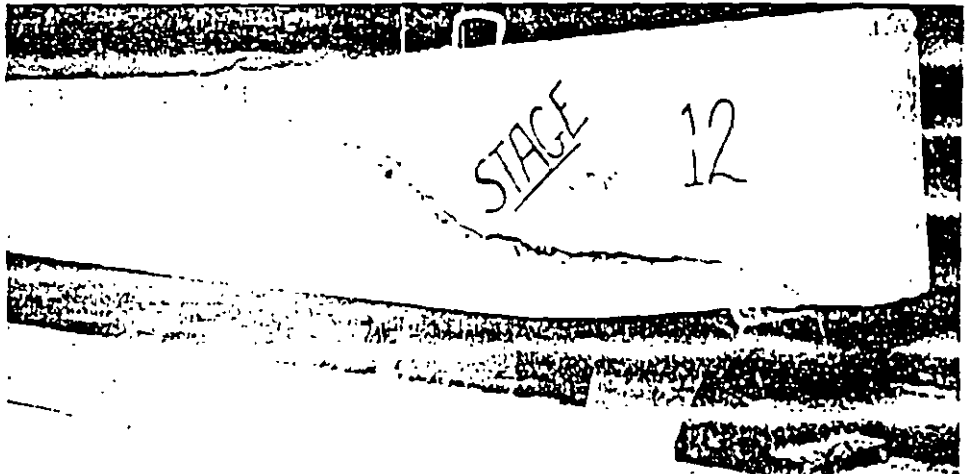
Principal diagonal tension crack at failure of beam in the preceding photograph (load stage 12).
